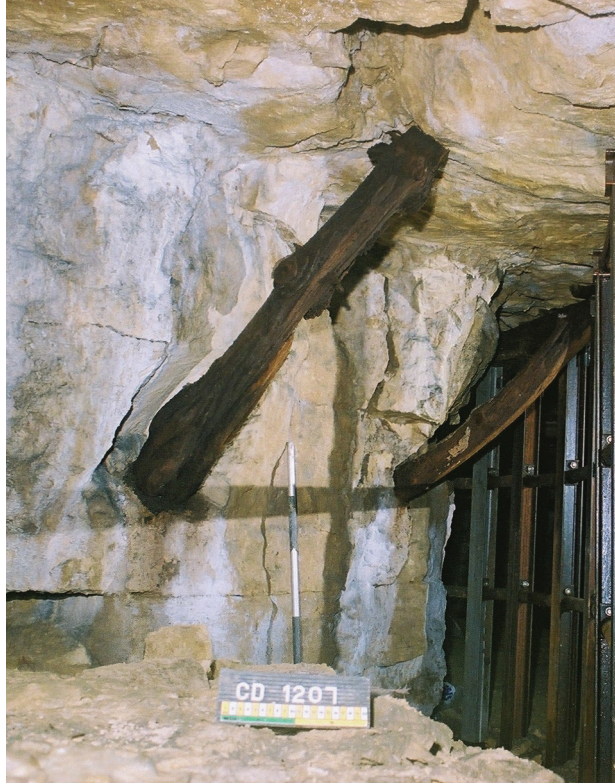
Use of timber sprags for roof support in West Firs (Quarry 2342)
